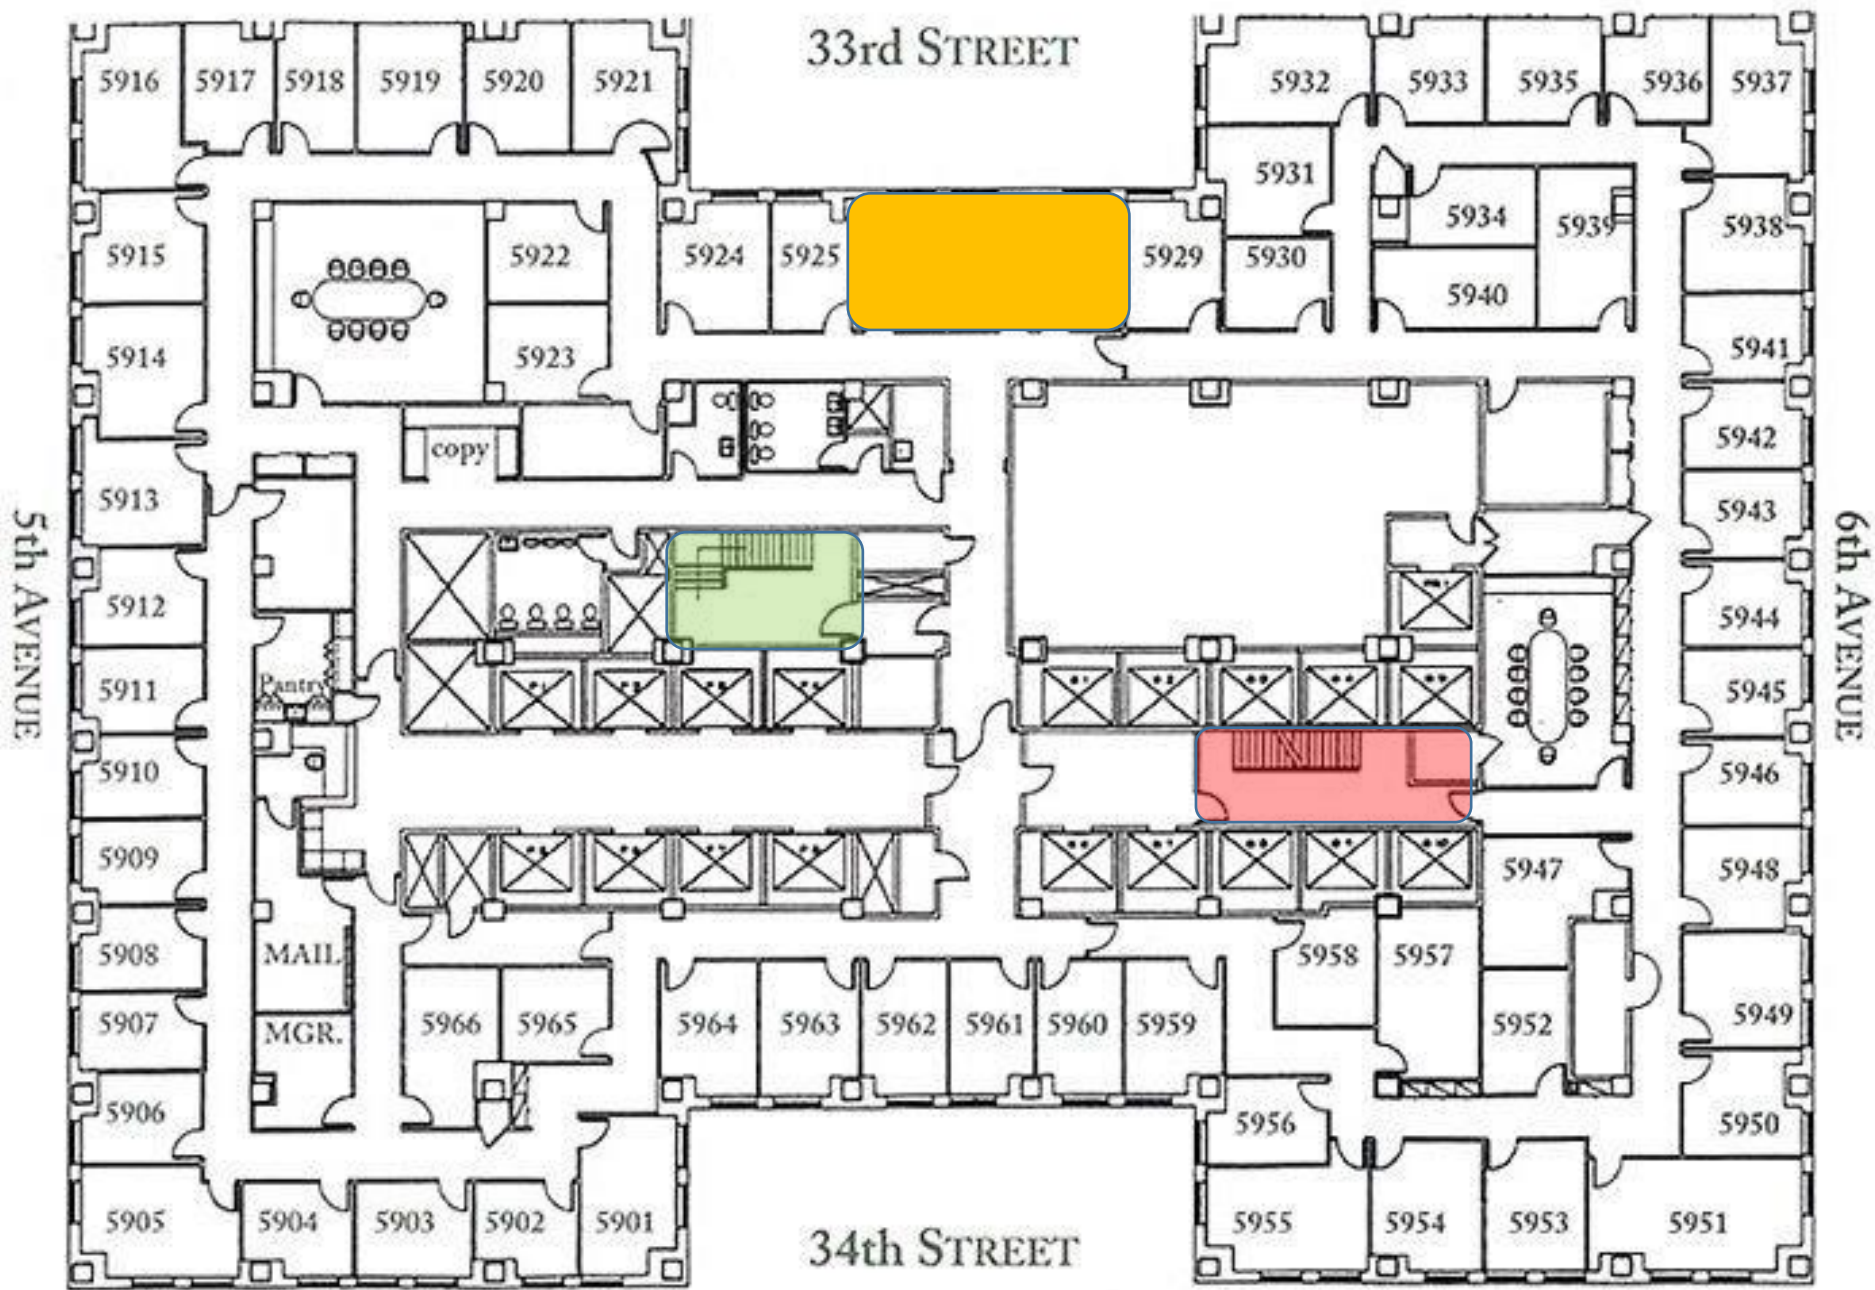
Plan view of 12th floor, showing area of significant fire damage
